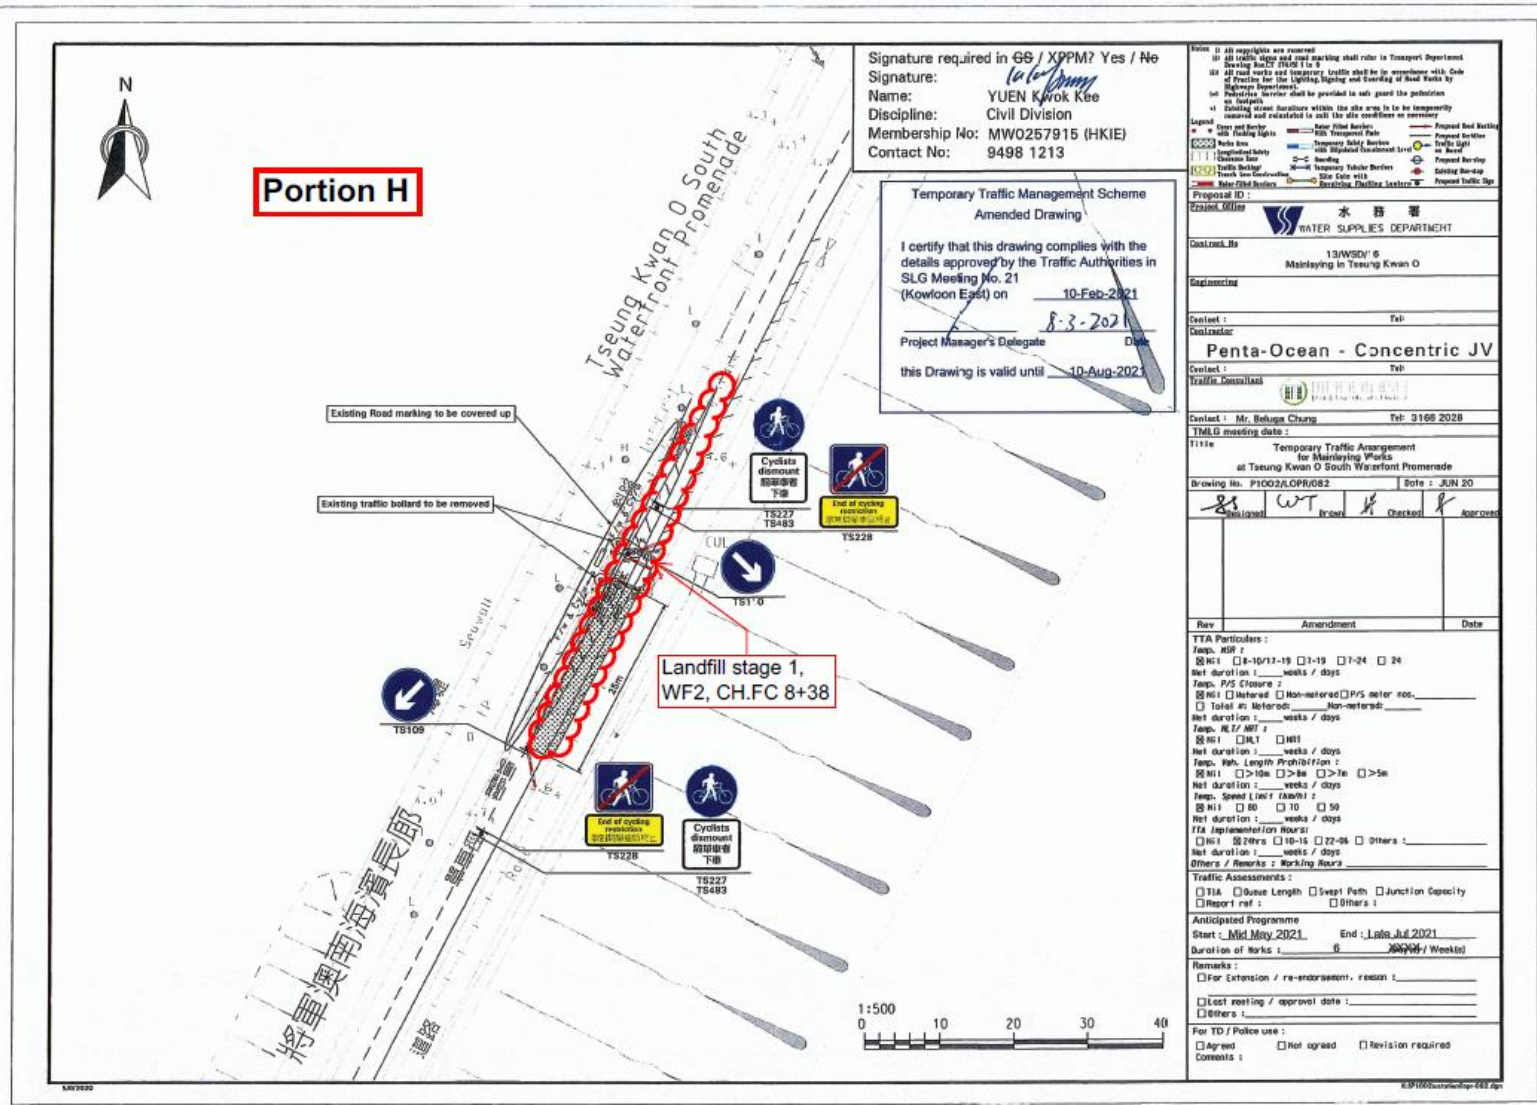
Location Plan – Landfill Stage 1 (Area FC8+38)
